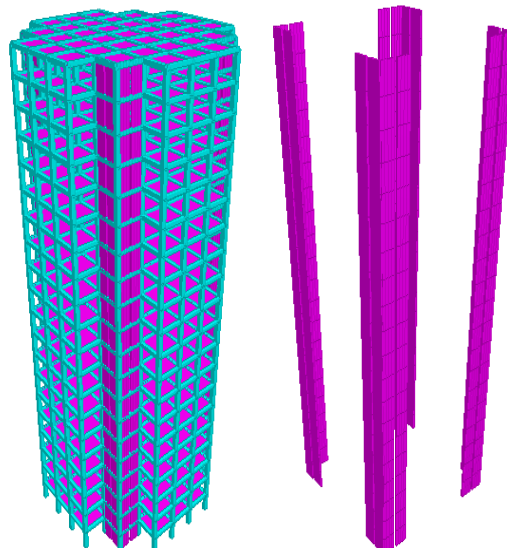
Building SOB: Shear wall with 11.11 % opening
